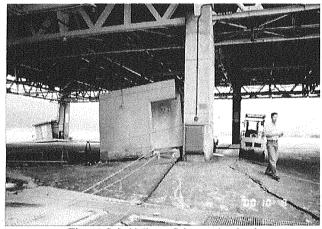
Sakai Minato fisherman's wharf Settlement of subsoil caused the concrete pavement to be bulged by the pile foundation
